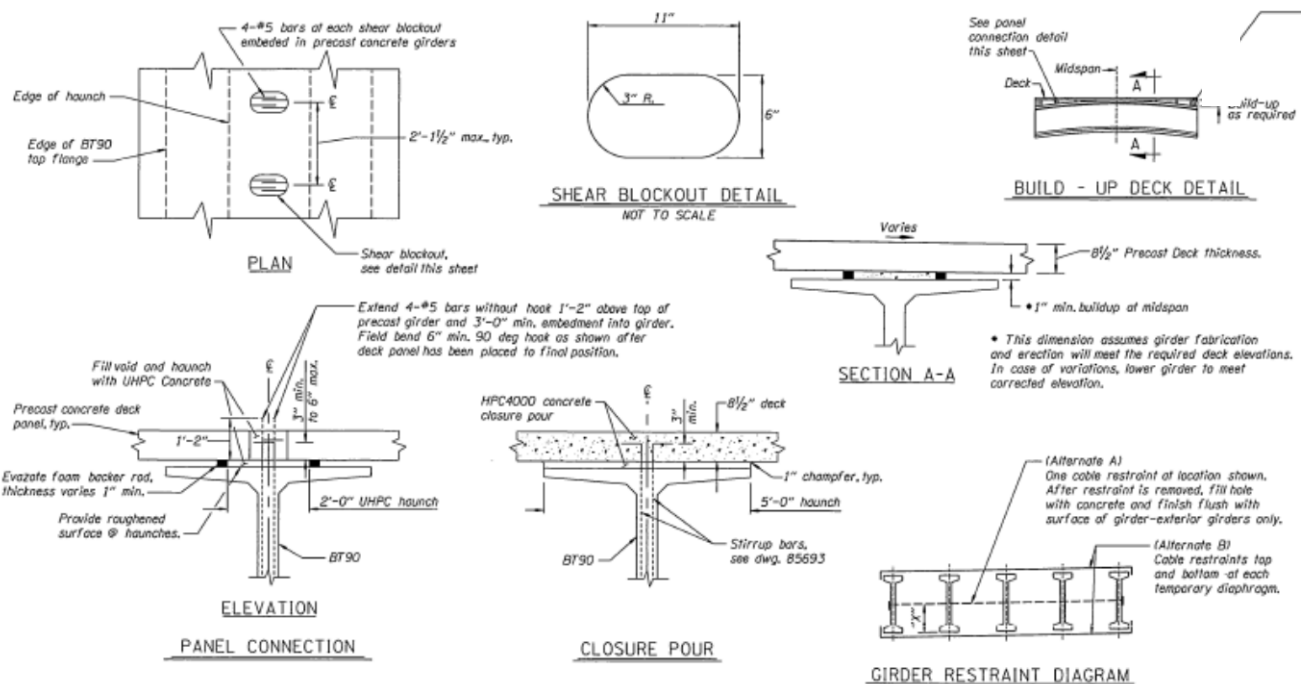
Diagram. Bridge 21252 shear pocket blockouts, haunch connections, and closure pour details.
